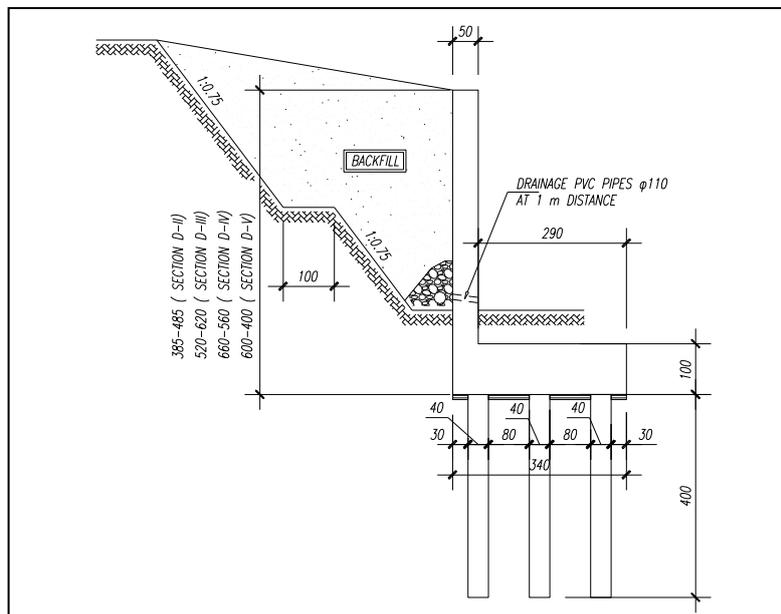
Cross-section through reinforced retaining walls on pile foundation.
